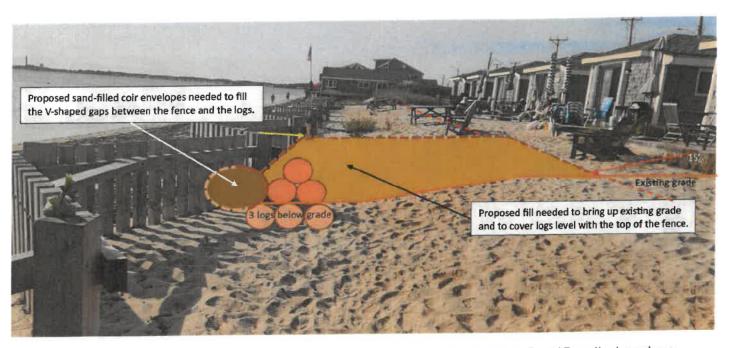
Detailed cross-section of the three proposed components of restoring and protecting the Primary Frontal Dune:1) coir envelopes; 2) coir logs; and, dune nourishment planted with beach grass.
